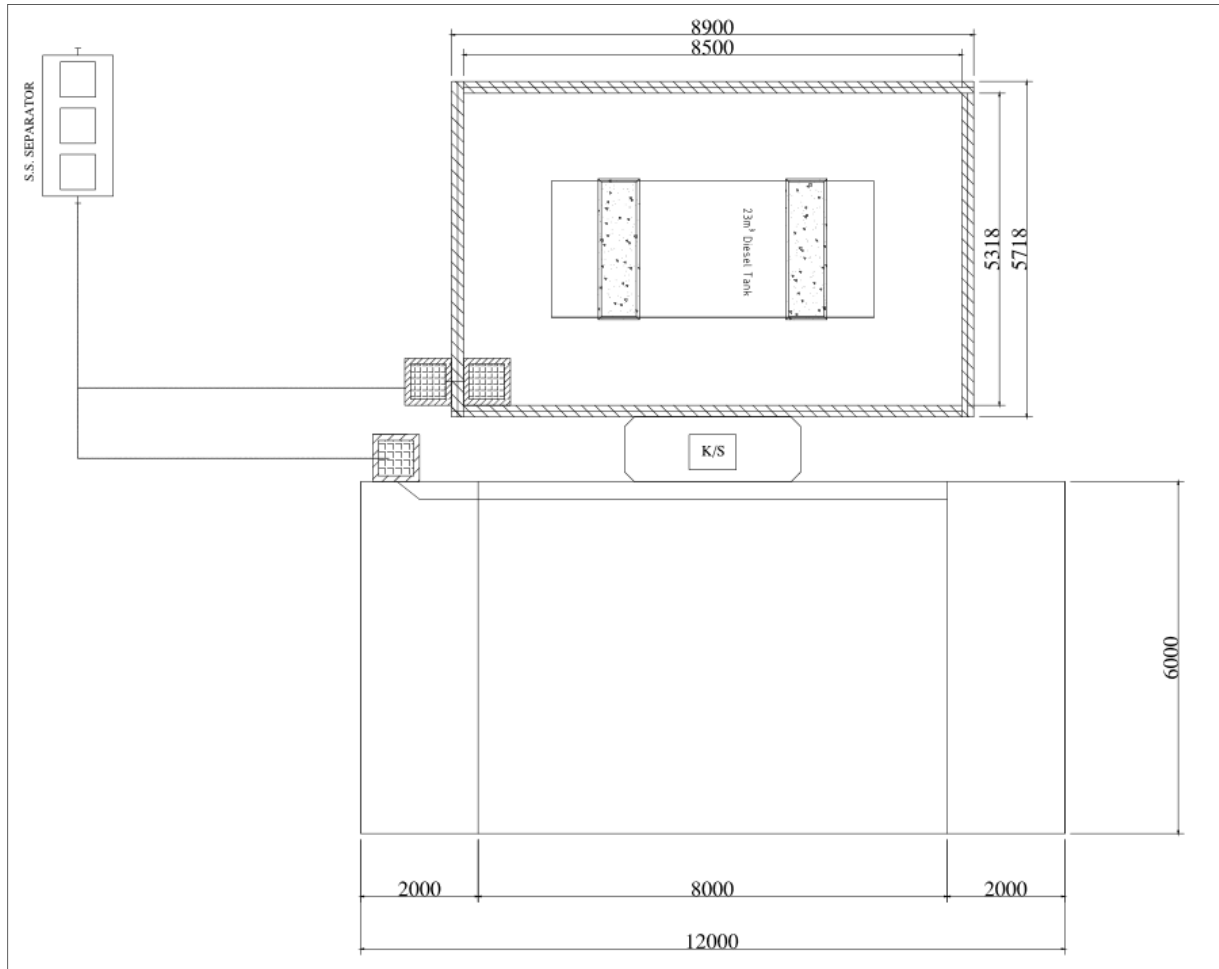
Design of installation set-up, with concrete floor at dispensing areas
